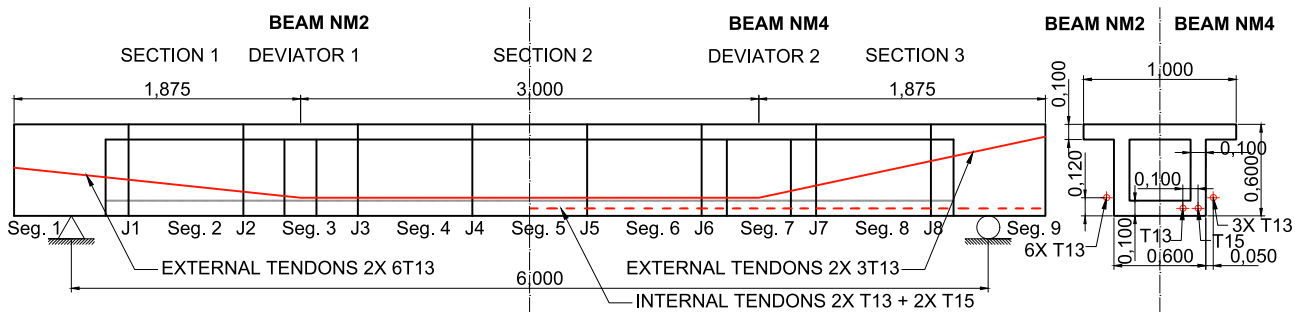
Elevation view and cross section of beams NM2 (left half of the span) and NM4 (right half of the span), and cross section.
